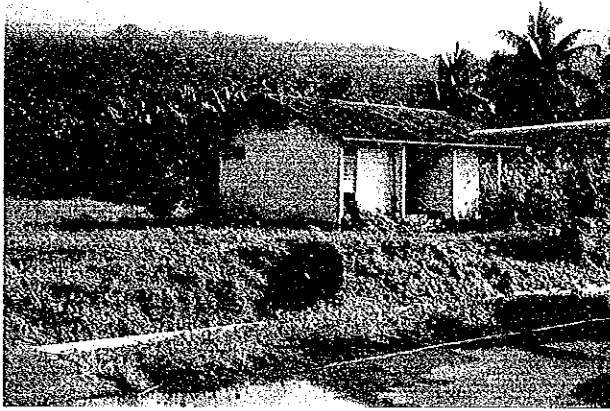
Masonry Building in Ende Airport, No Damage
